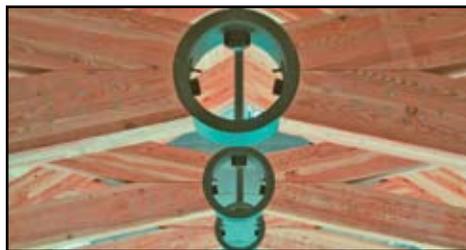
Truss construction with BVD connectors anchored in a steel ring housing.
